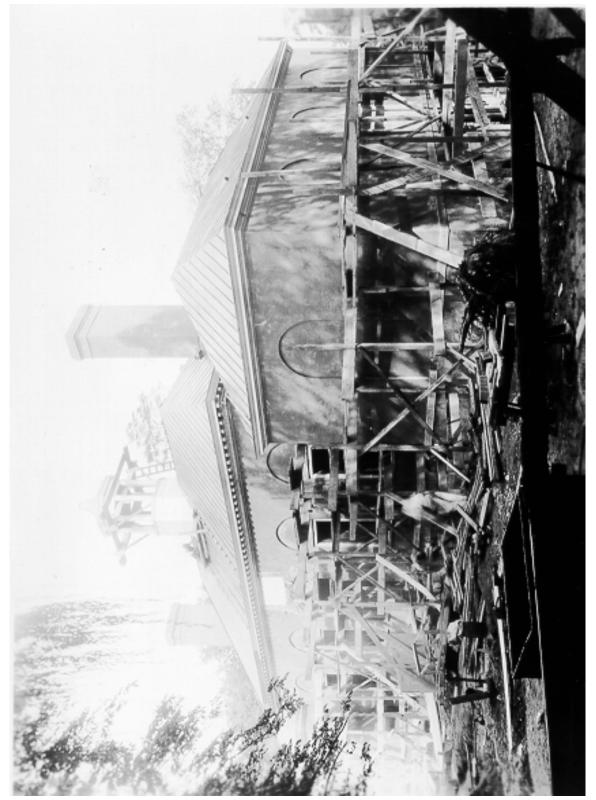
Morristown Museum Building: south façade and east elevation of east wing, brick walls before stuccoing (August 31, 1936).
